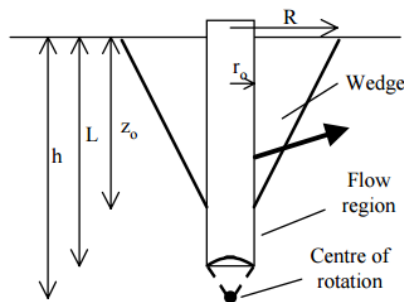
Soil failure zones during horizontal loading, (Randolph, 2002)
